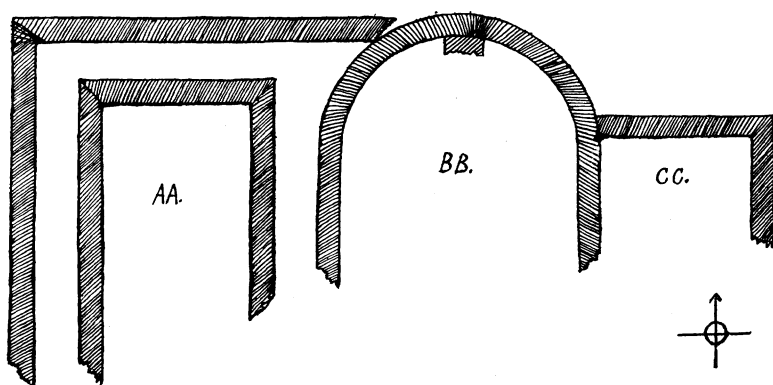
STATION VILLA. ROOMS AA, BB, CC, PLAN.
